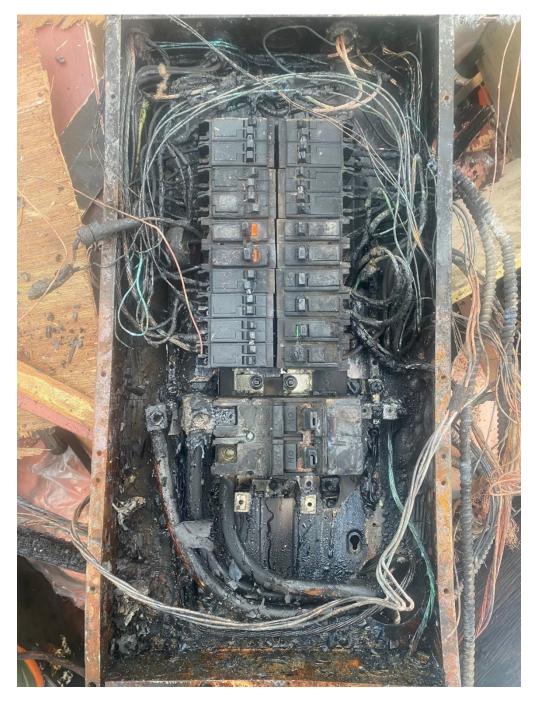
Panel removed and laid on ground showing inside of electrical panel. This shows the heat damage that occurred within the electrical panel. Not all insulation of electrical cabling has been melted away.
